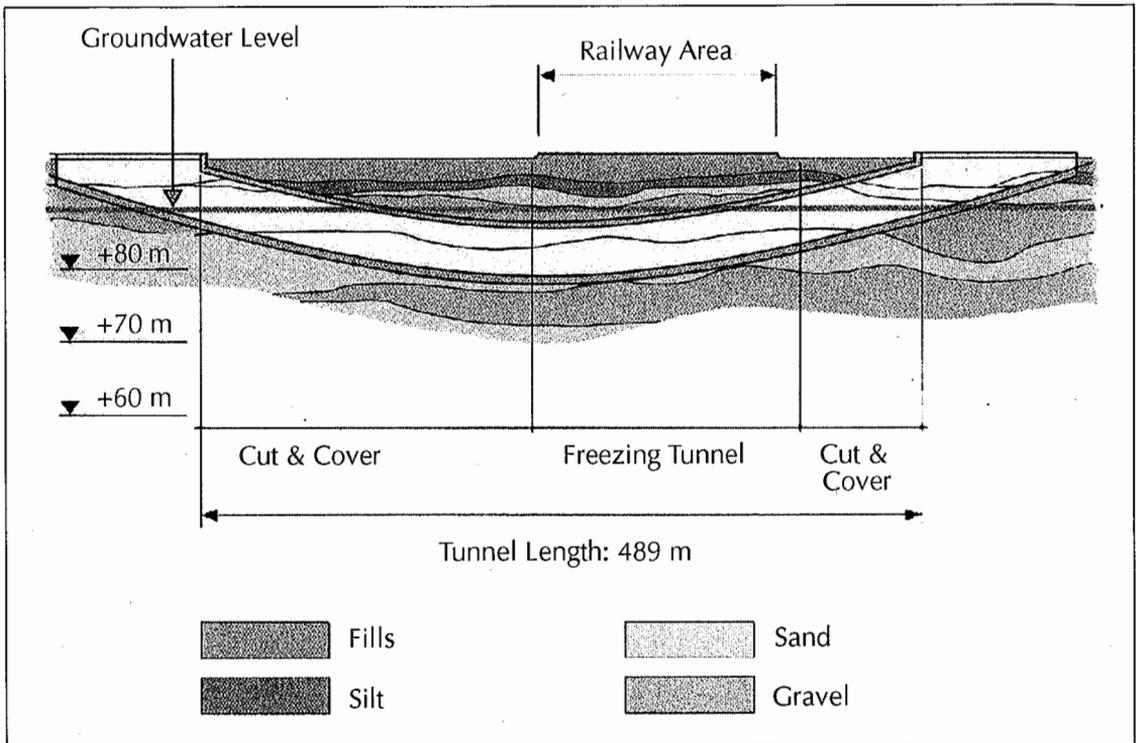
A model of the tunnel and railroad alignment for the Fahrlachtunnel project.
